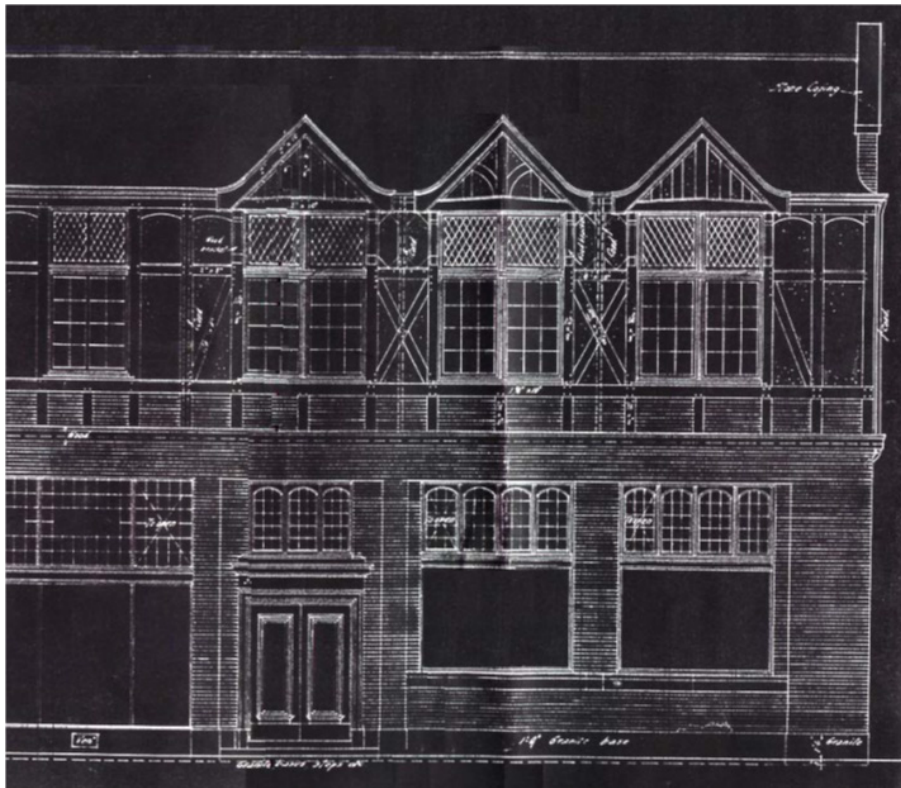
Architect's plans for the new Clarendon Block - part of the Donald Street facade. (City of Winnipeg Historical Buildings Committee, 1999).
